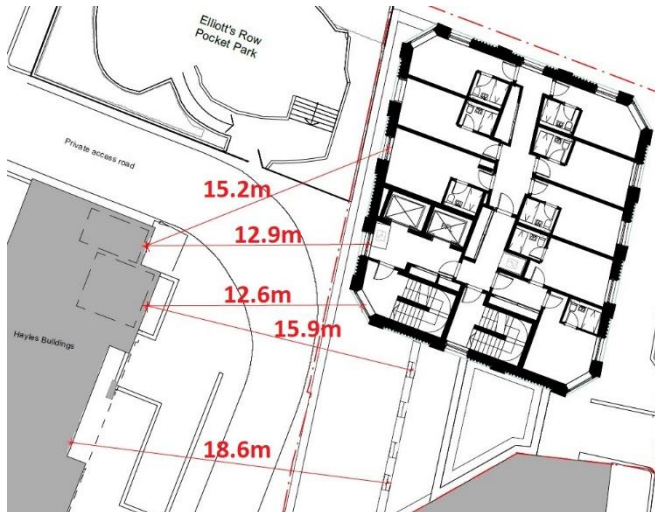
(above): First floor plan of the existing building, showing the distances to the clear-glazed windows at the Hayles Buildings
